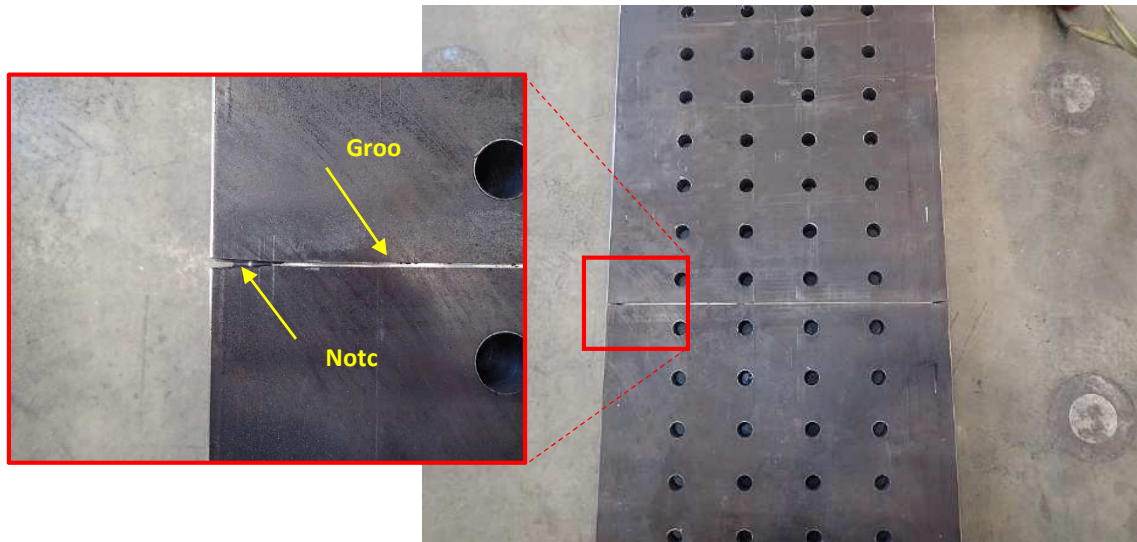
Edge notch & groove for fatigue crack growth on fracture specimens
